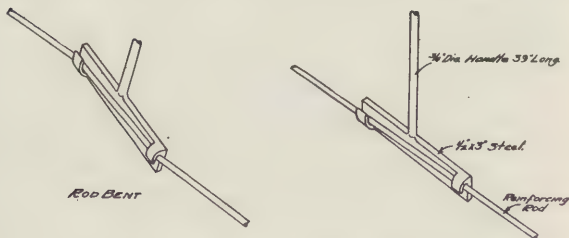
"Hickey" for Bending Flat Slab Steel.
